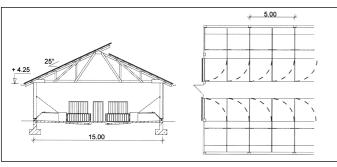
Section and ground plan for keeping fattening pigs kennel housing with littered dunging area
